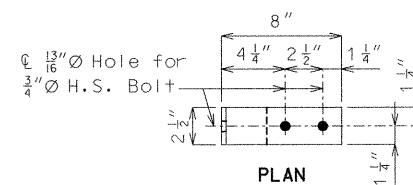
DETAILS OF REPAIRS IN PLATE GIRDER SPANS
